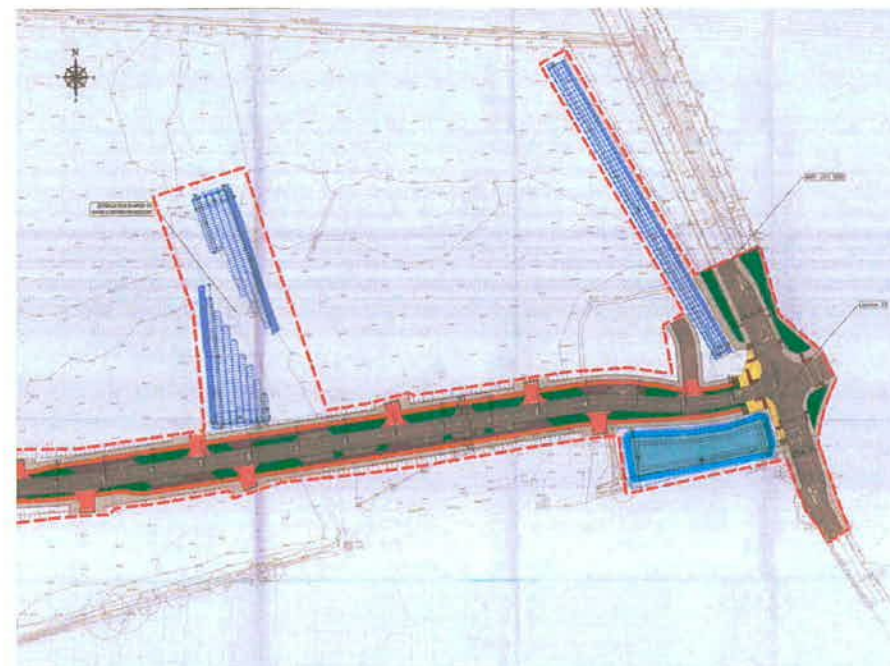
Application Layout for Link Road [Reg Ref XX XXXX]
